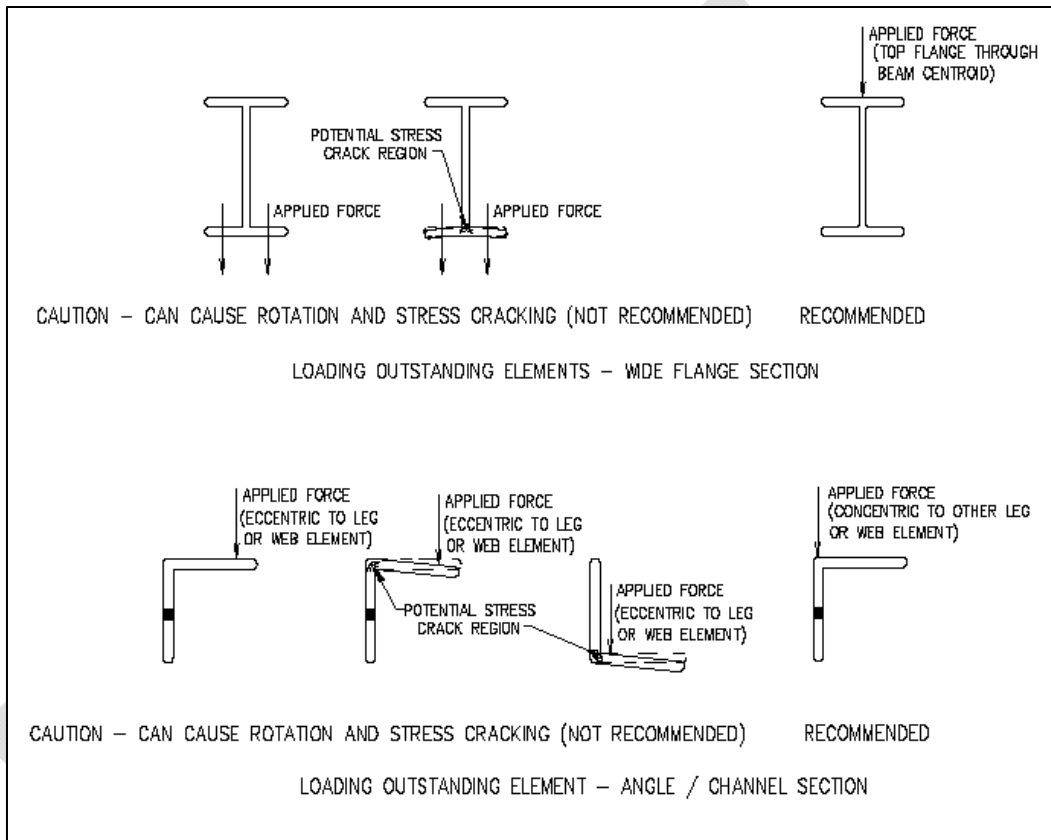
RECOMMENDED LOAD AND FORCE APPLICATIONS
